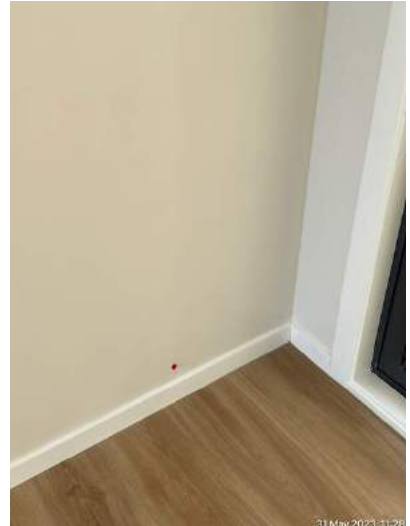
Kitchen wall - plaster/paint imperfection
